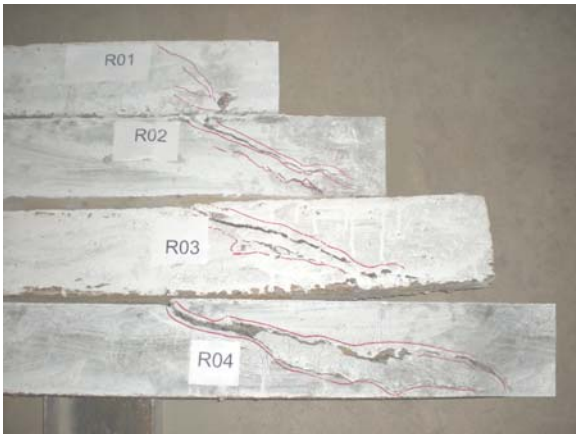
Crack patterns and load points of the failed specimens- R01, R02, R03 and R04.
